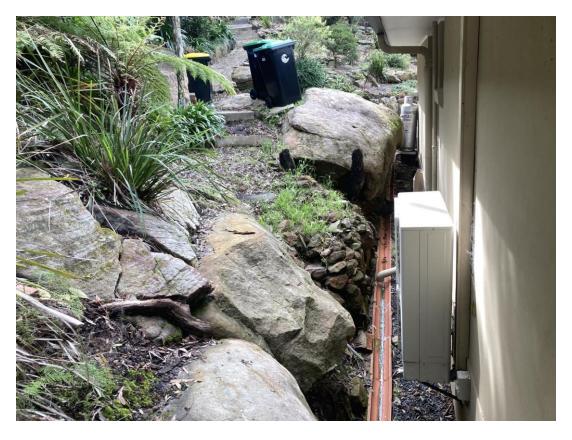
Showing extent of existing excavation to land (Northern side of dwelling).
